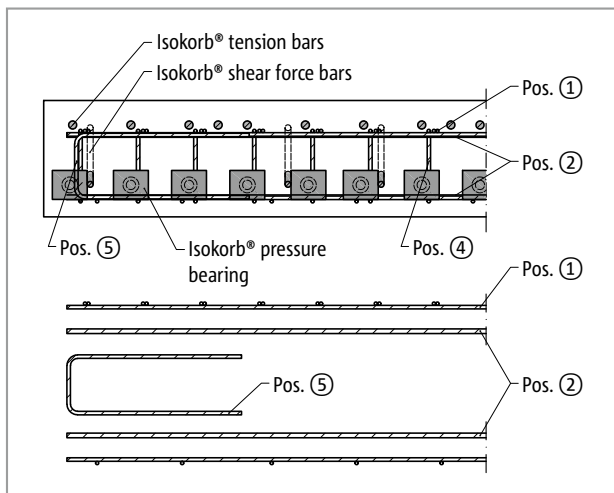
Schöck Isokorb® T type K-M12: On-site reinforcement on the balcony side in the Section A-A; Pos.5 = structural edging at the free edge perpendicular to the Schöck Isokorb®
